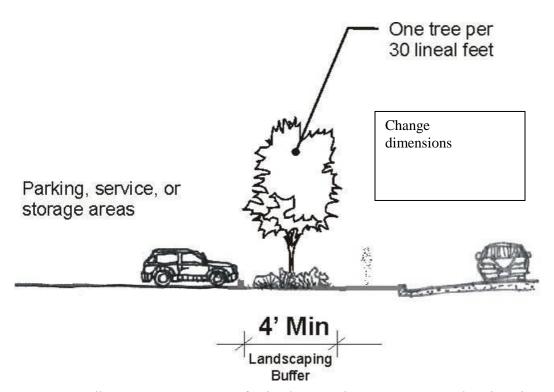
Illustrating requirements for landscaping between a street and parking lot
